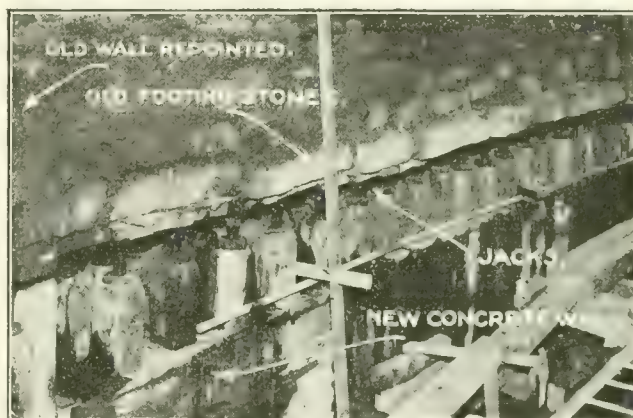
JACKS PLACED BETWEEN NEW CONCRETE WALL AND OLD FOOTING
